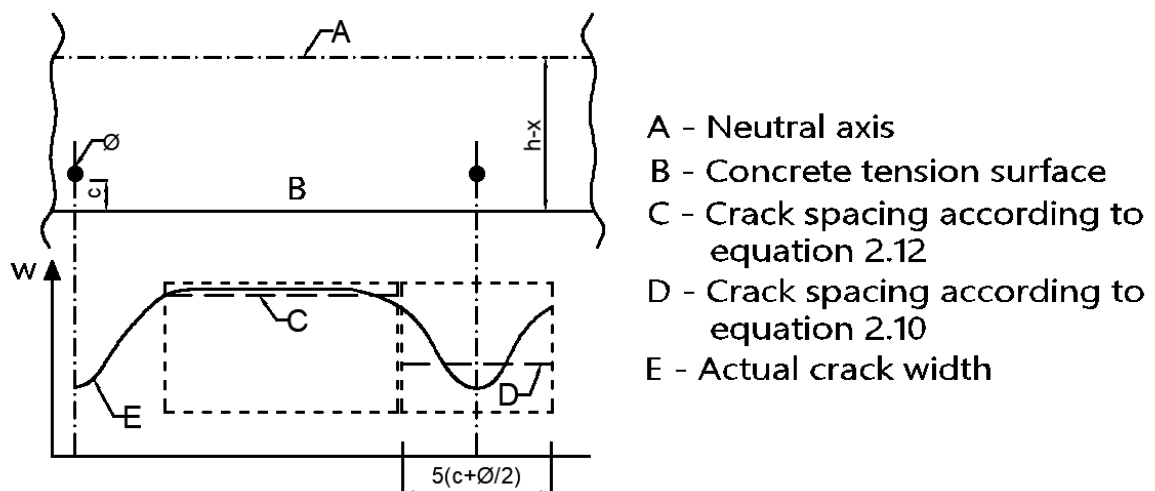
Crack width, w , at concrete surface relative to distance from bar based on (EN 1992-1-1, 2004).
